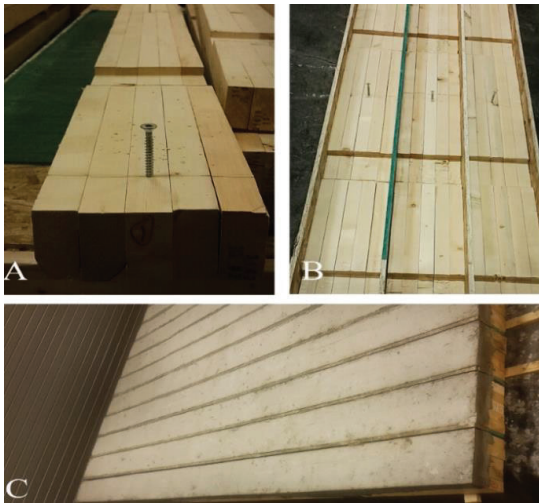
Specimen preparation A) NLT with notches and screws B) Formwork for concrete casting C) After concrete curing
